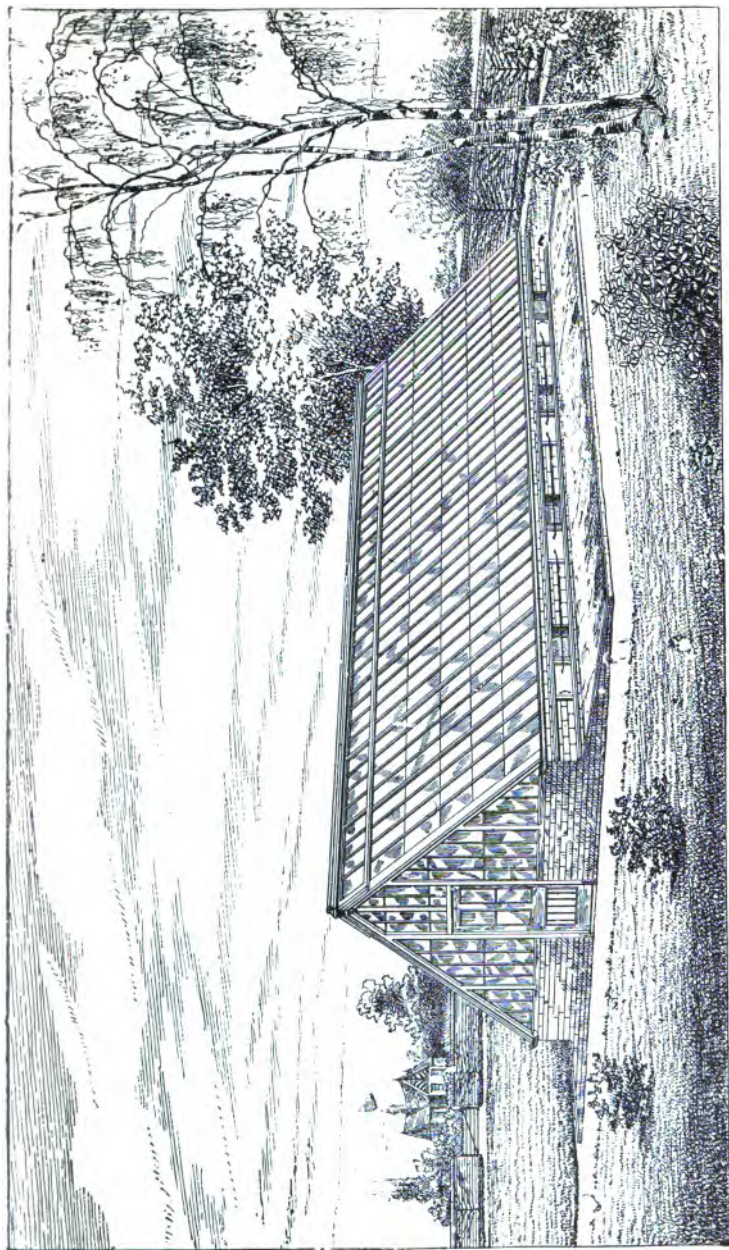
SPAN-ROOFED PEACH-HOUSE, WITH VENTILATORS IN BRICKWORK.
